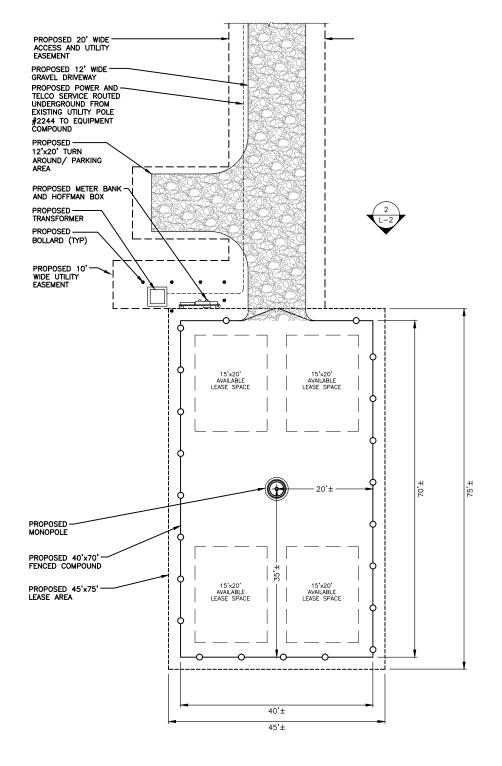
PROPOSED EQUIPMENT LOCATION PLAN
